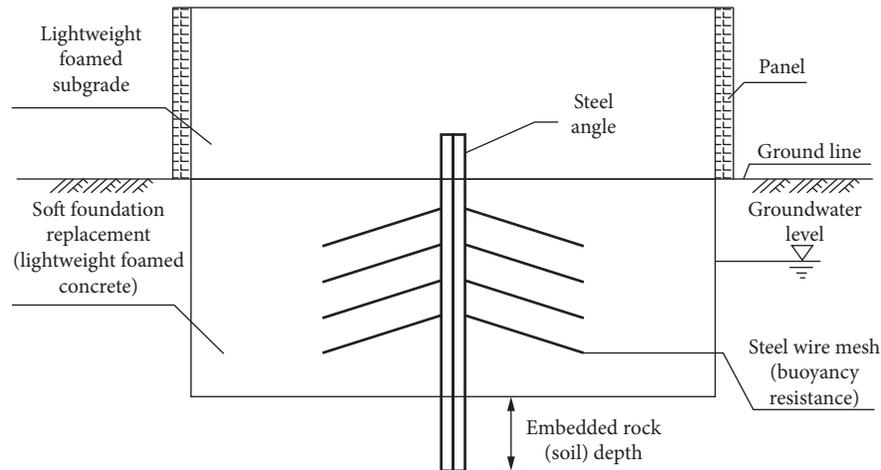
Steel angle and steel mesh adopted in design to keep foamed concrete from floating.
